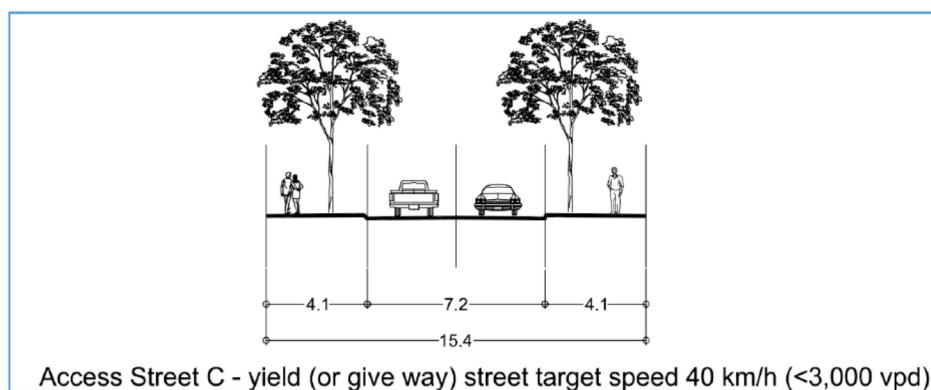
Typical 'Access Street C' indicative cross section subject to detailed design.
